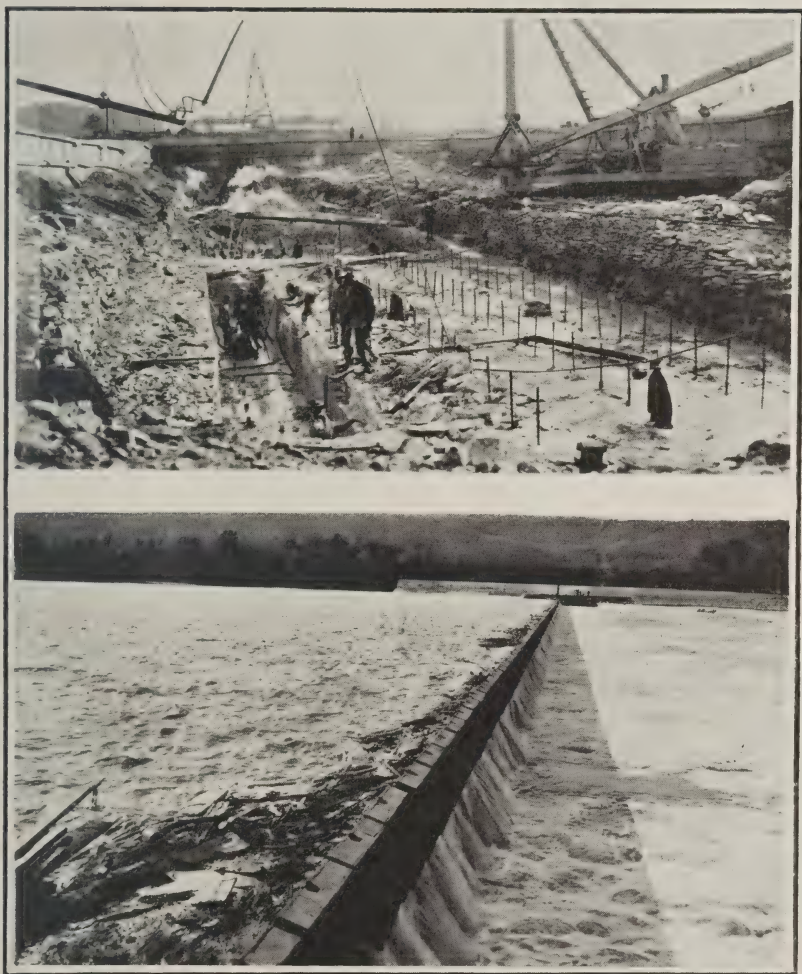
(upper). Preparing foundation bed for navigable pass, Dam 28, Ohio River, November 12, 1912. Notice 5-foot by 6-foot cut-off wall at upstream edge of dam with two rows of  $1\frac{1}{2}$ -inch twisted steel rods in bottom. Also three rows of same size rods spaced 4 feet center to center below cut-off wall. Rock is sound gray sandstone, except near middle of picture, where sound rock was 5 to 10 feet lower than on either side.
